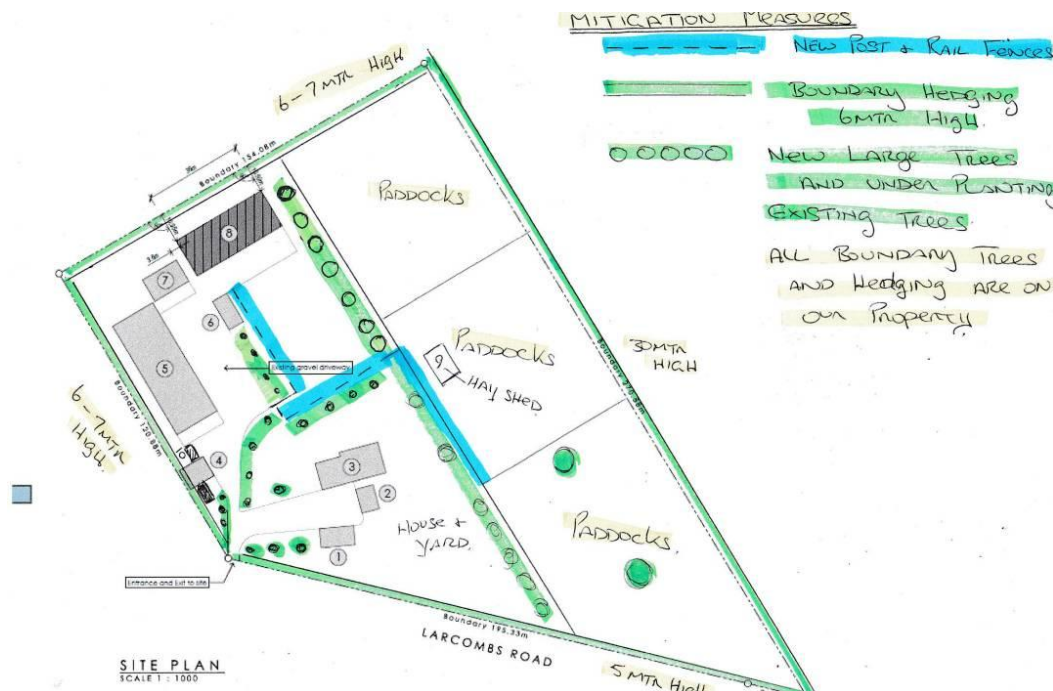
Landscape Plan (Source: Further Information dated 3 February 2025).
